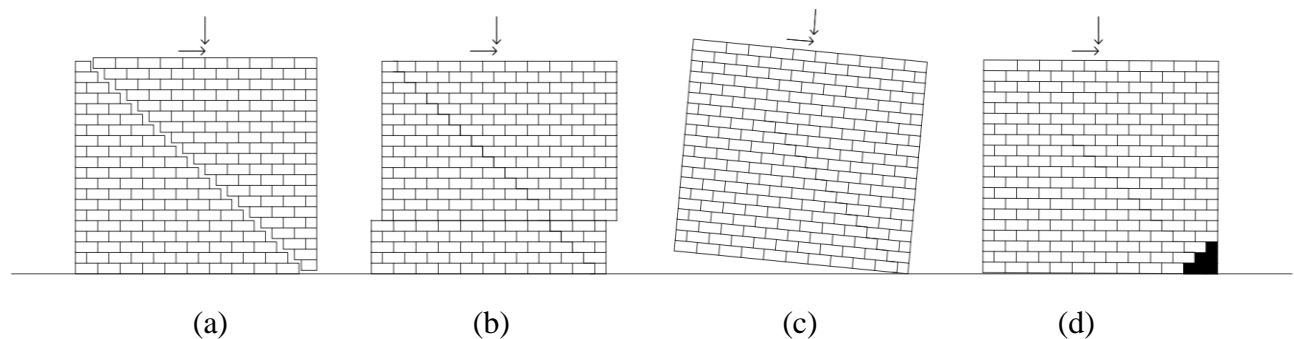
In-plane failure modes of masonry walls: (a) diagonal shear failure, (b) sliding failure, (c) rocking, (d) toe crashing based on ElGawady et al. (2006)
